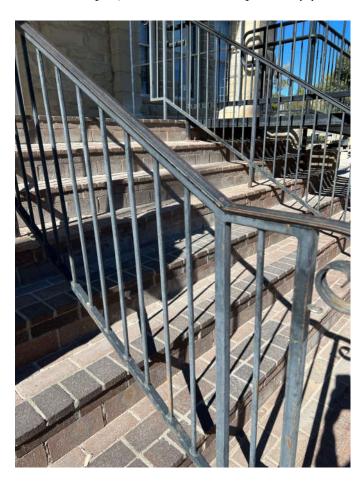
Guardrails are needed along the north and south sides of the main entry porch. Their design should match the existing railing system.
